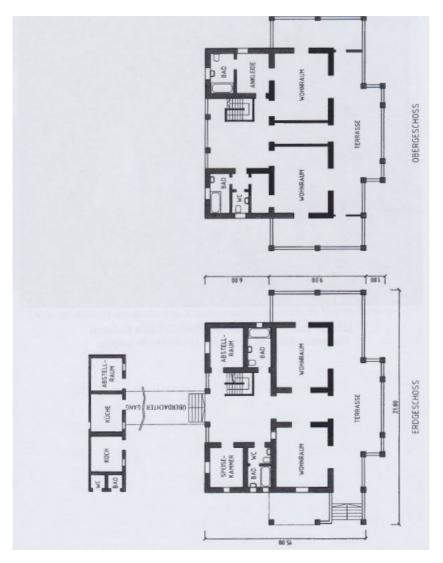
Floor plan of the colonial building in Dar es Salaam Source: Author's records.
